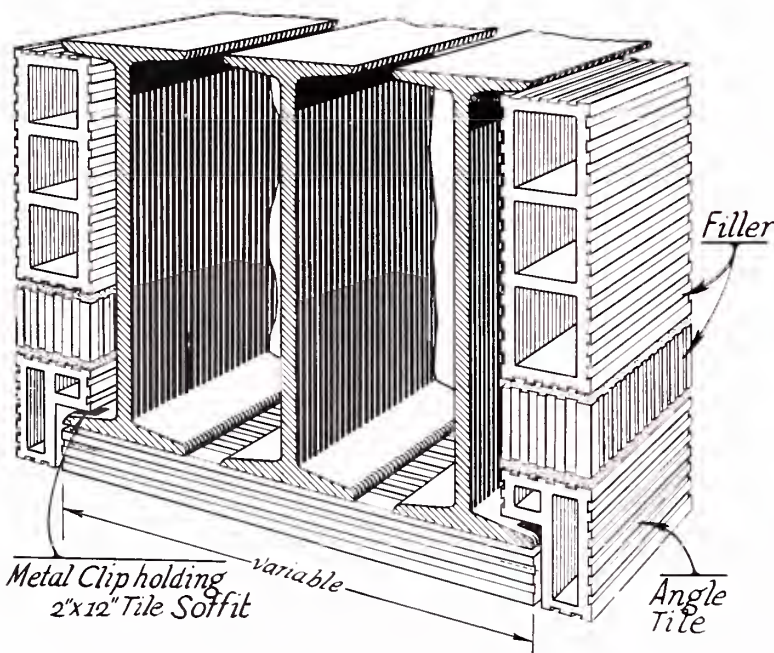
Angle and soffit method of protecting triple girders, showing use of metal clips to retain soffit
